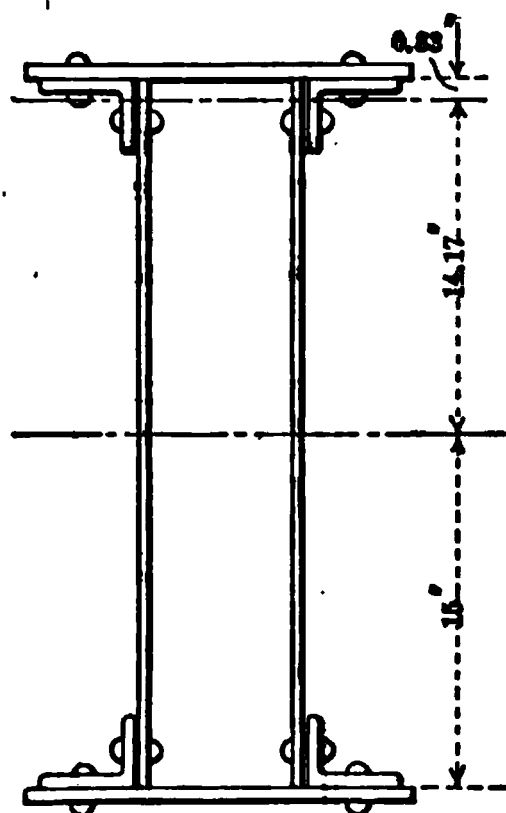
Moment of Inertia of Cross-section of Plate-and-angle Box Girder
